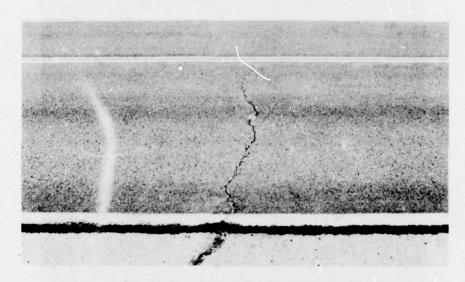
Fort Devens--reflected crack in Barnum Road outside of test areas
